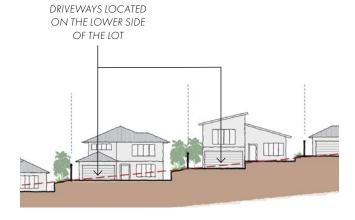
Driveway crossovers to be provided on the lower side of lots to support convenient access
